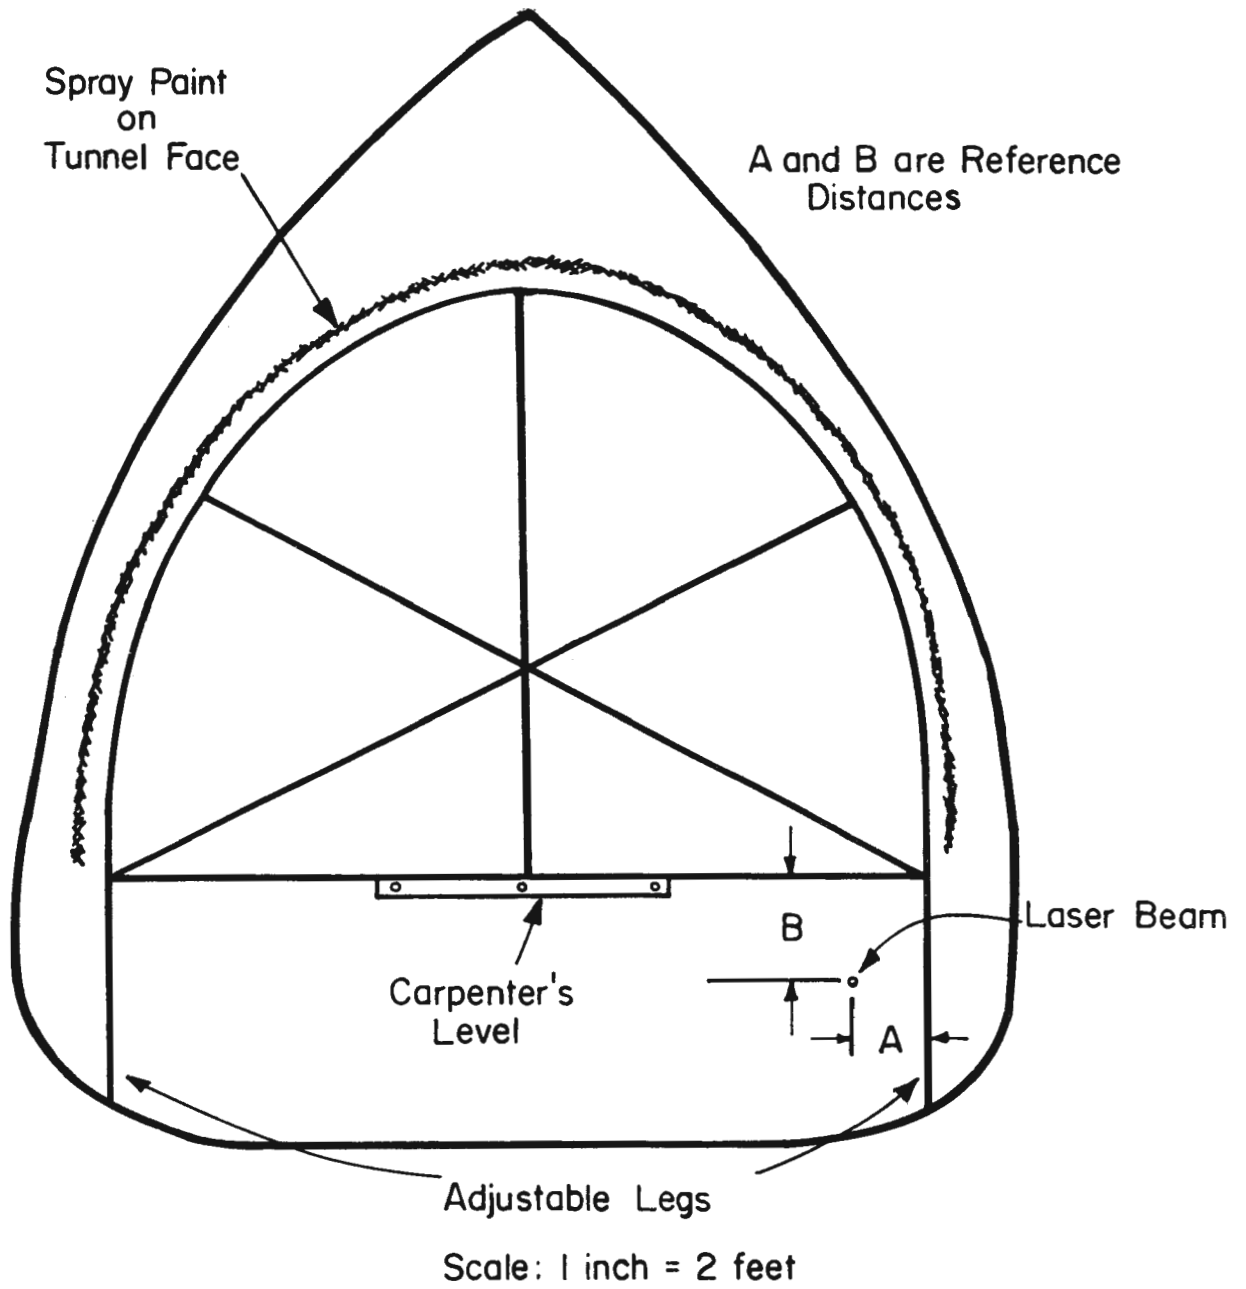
TUNNEL CROSS SECTION SHOWING CONTROL TEMPLATE
